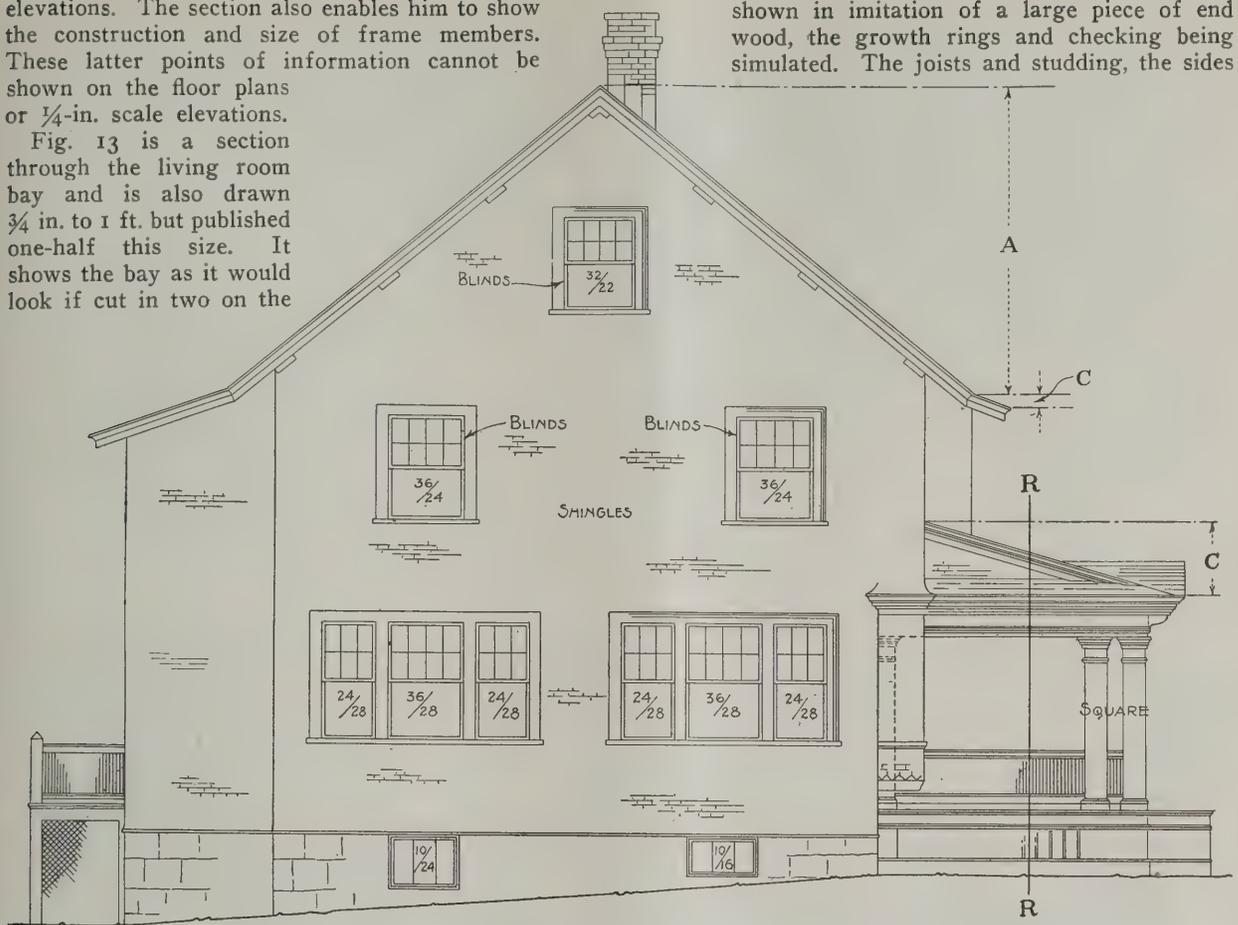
Left Side or Southeast Elevation—Scale 1/8-In. to the Foot
